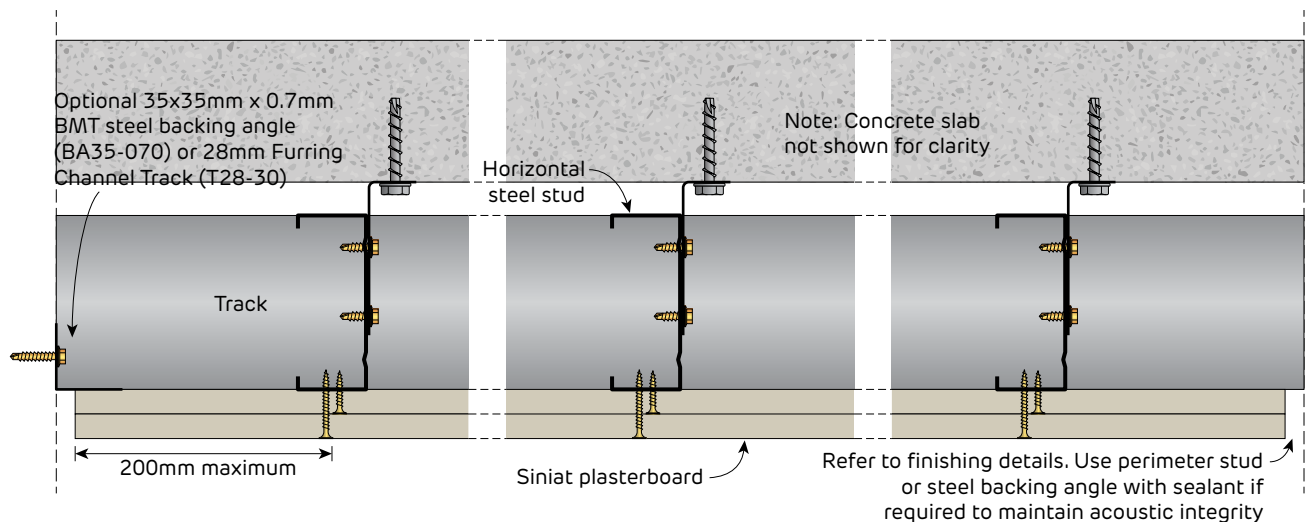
Stud Ceiling Type A4 - Edge Detail
